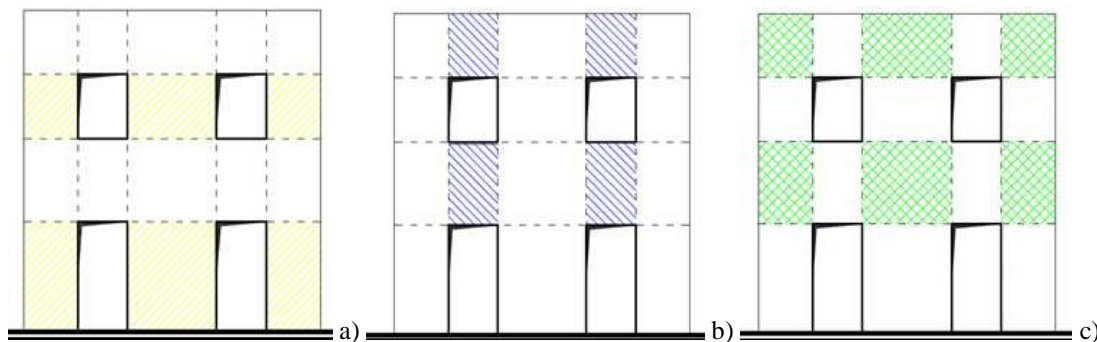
Identification of macro-elements in a masonry façade: piers (a), spandrels (b) and node panels (c).
